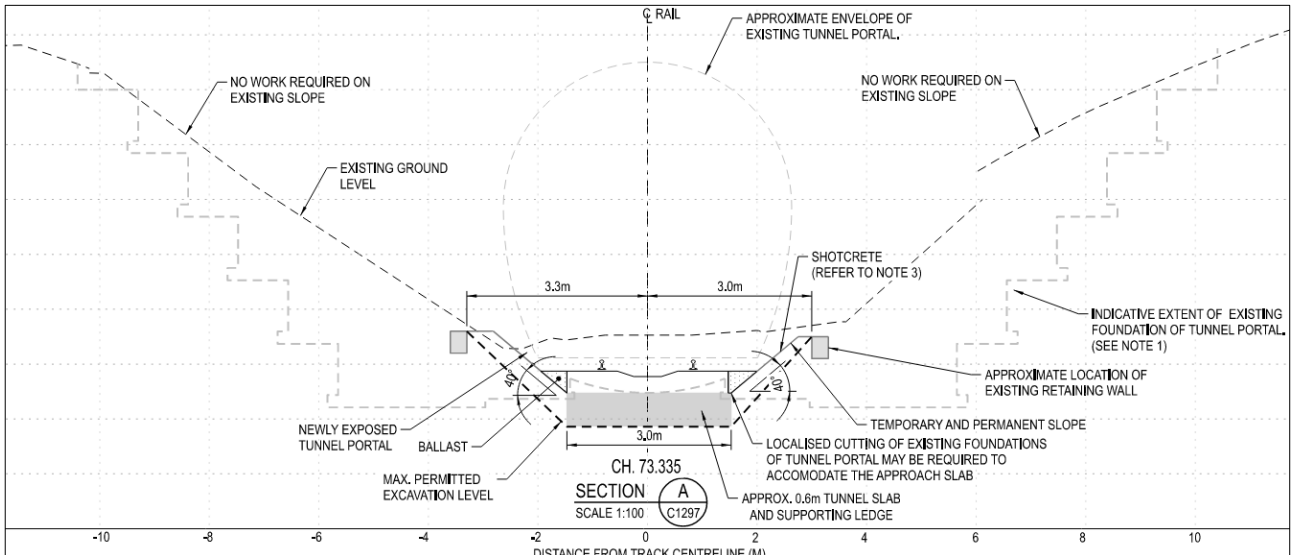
TYPICAL SECTION AT CH. 73.335 SHOWING RETAINING WORKS AT DOWN-END PORTAL (SOURCE: AURECON/VLINE)
